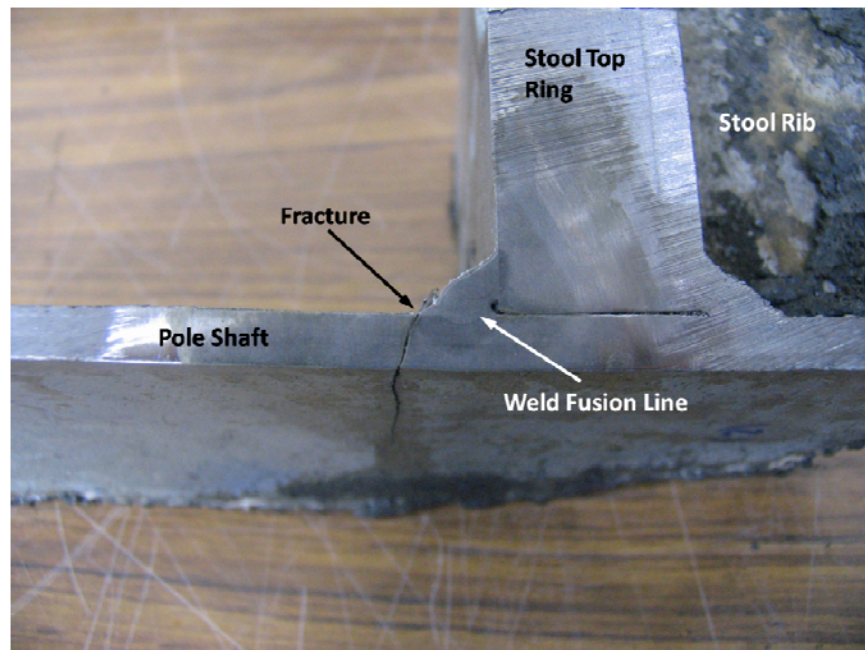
Section of Stool Detail Fillet Weld
